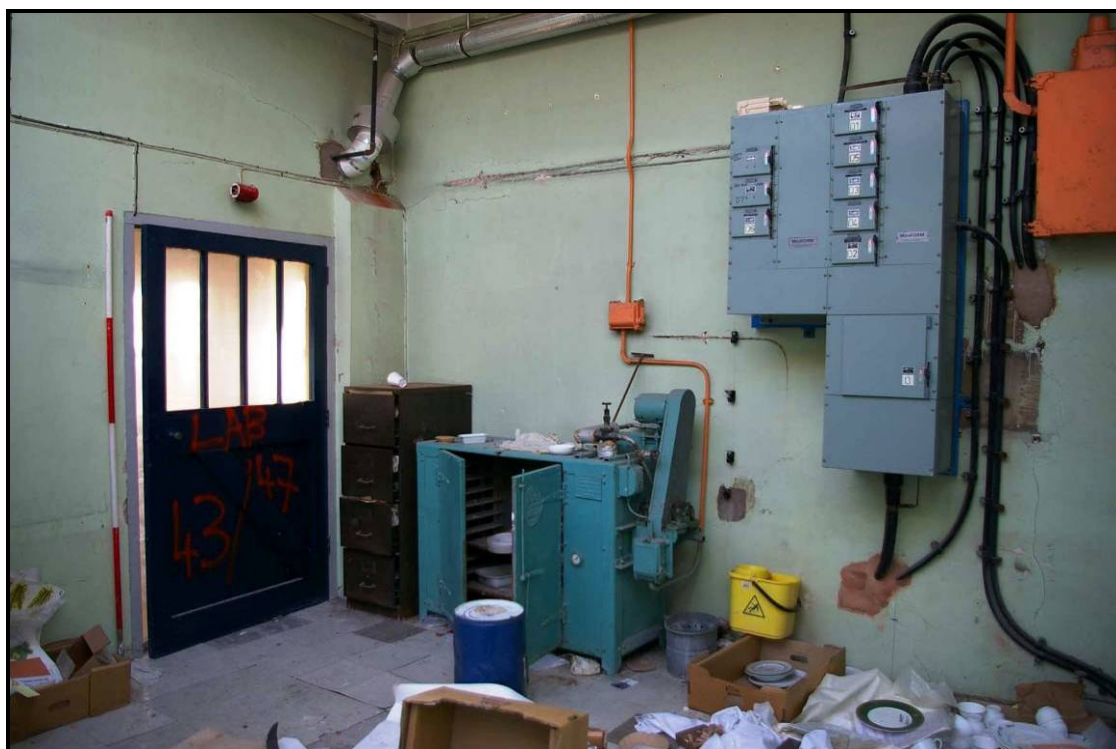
Oven and electrical switchgear panel on the eastern workshop of the first floor
